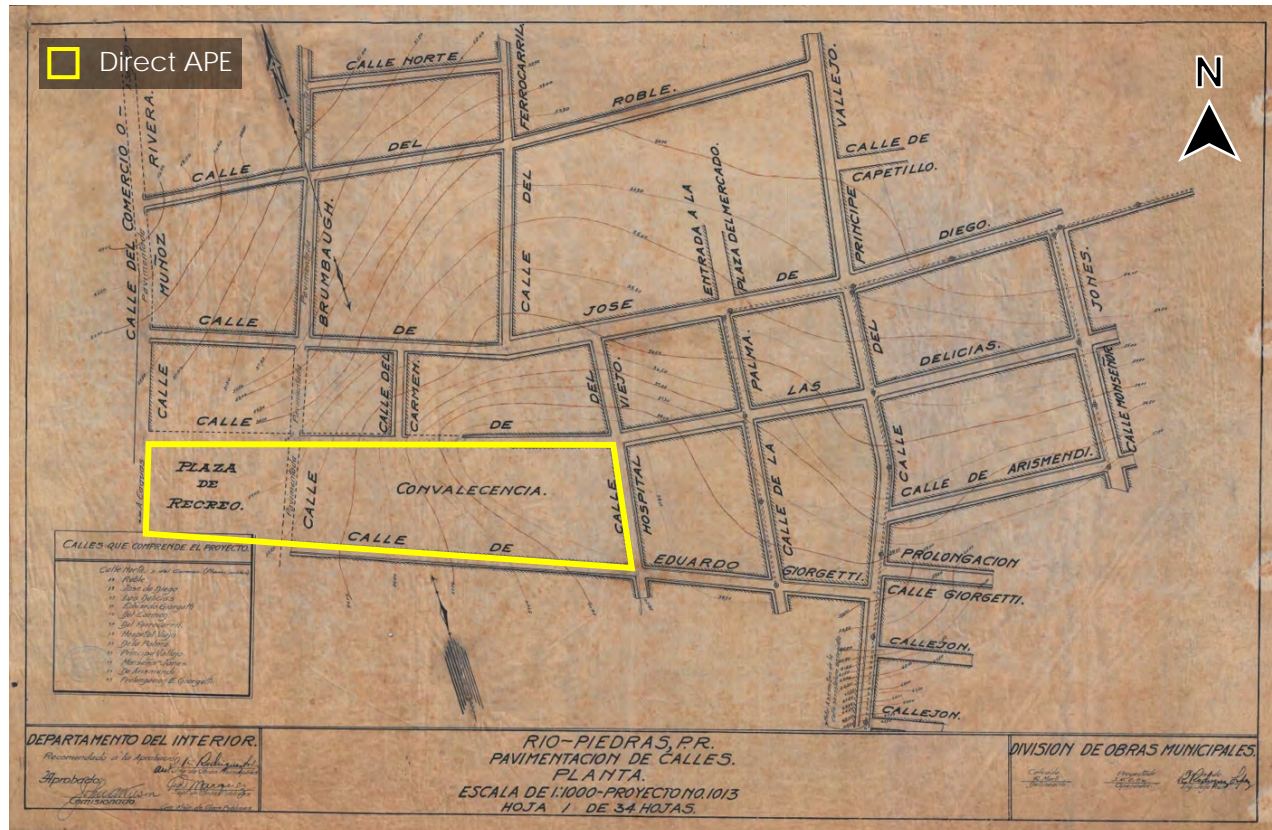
Circa 1920 pavement plan for the streets of Río Piedras, titled Plano de pavimentación de las calles de Río Piedras (Source: Mapoteca del Archivo General de Puerto Rico (AGPR), <https://archivonacional.com/PL/1/1/2579>).
